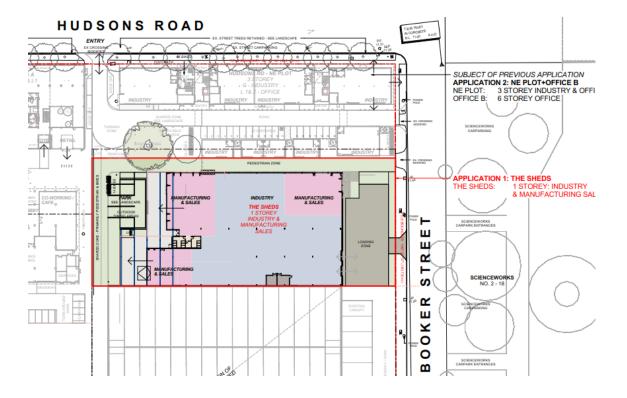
Proposed layout of building, Source: Architectural plans (TP400 Rev A) by Six Degrees Pty Ltd
